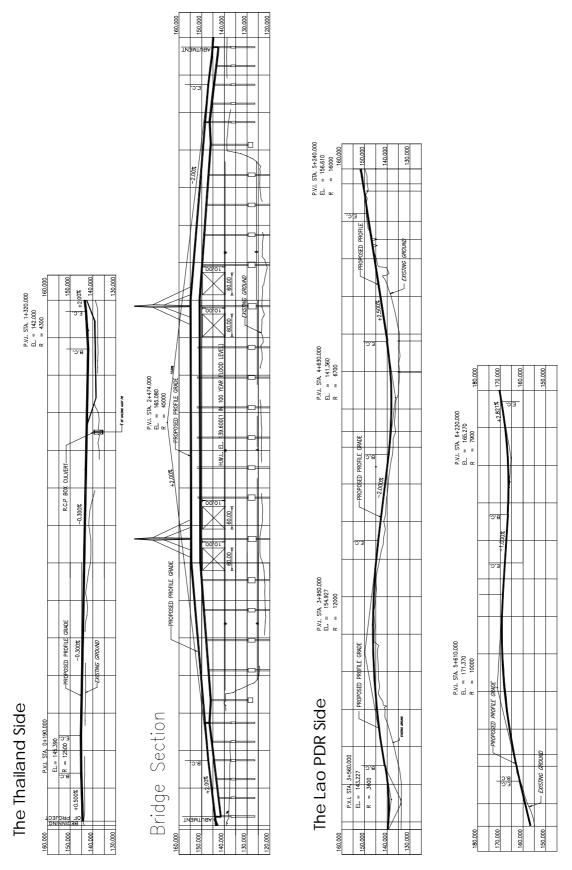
Vertical Alignment of the Bridge and Connecting Roads
